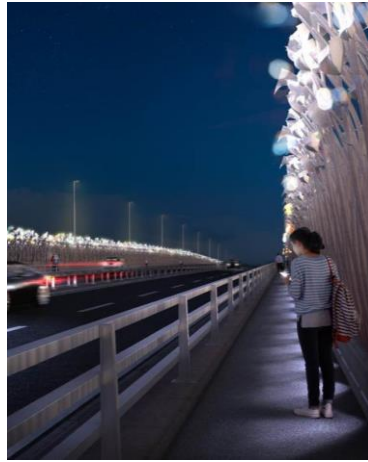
Proposed sculptural barrier on the Foyle Bridge.
